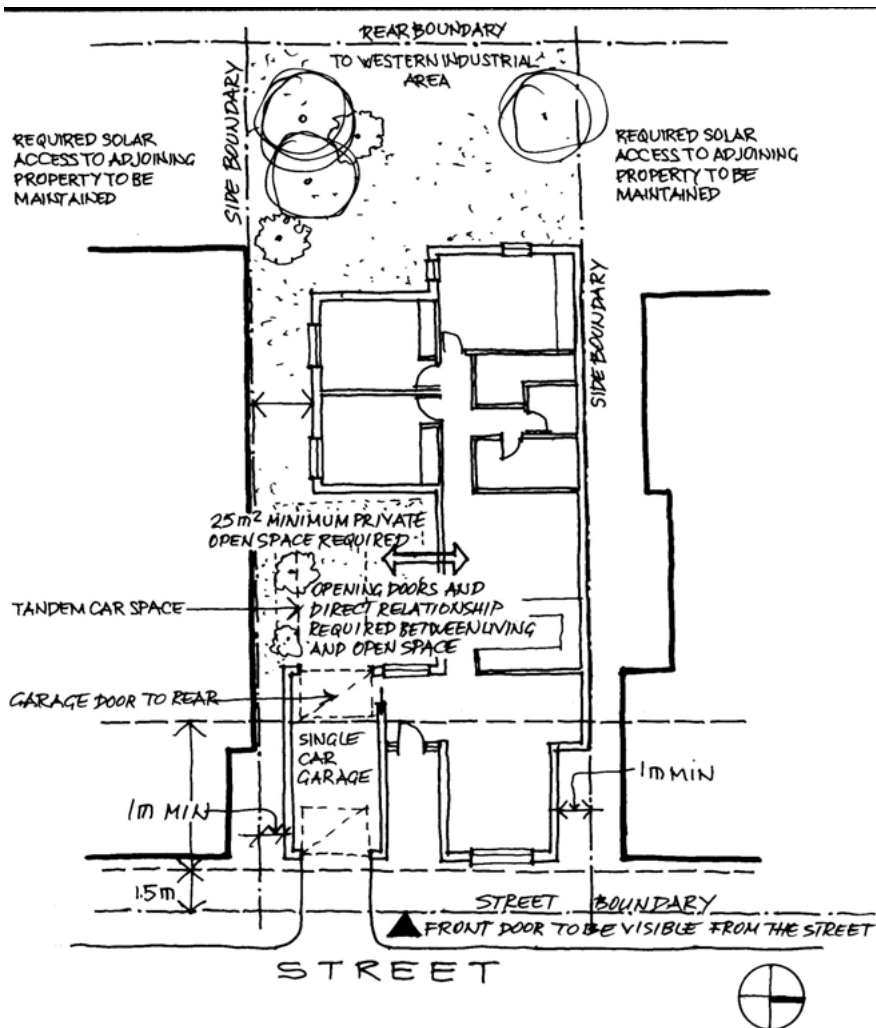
Single storey courtyard dwelling layout.
